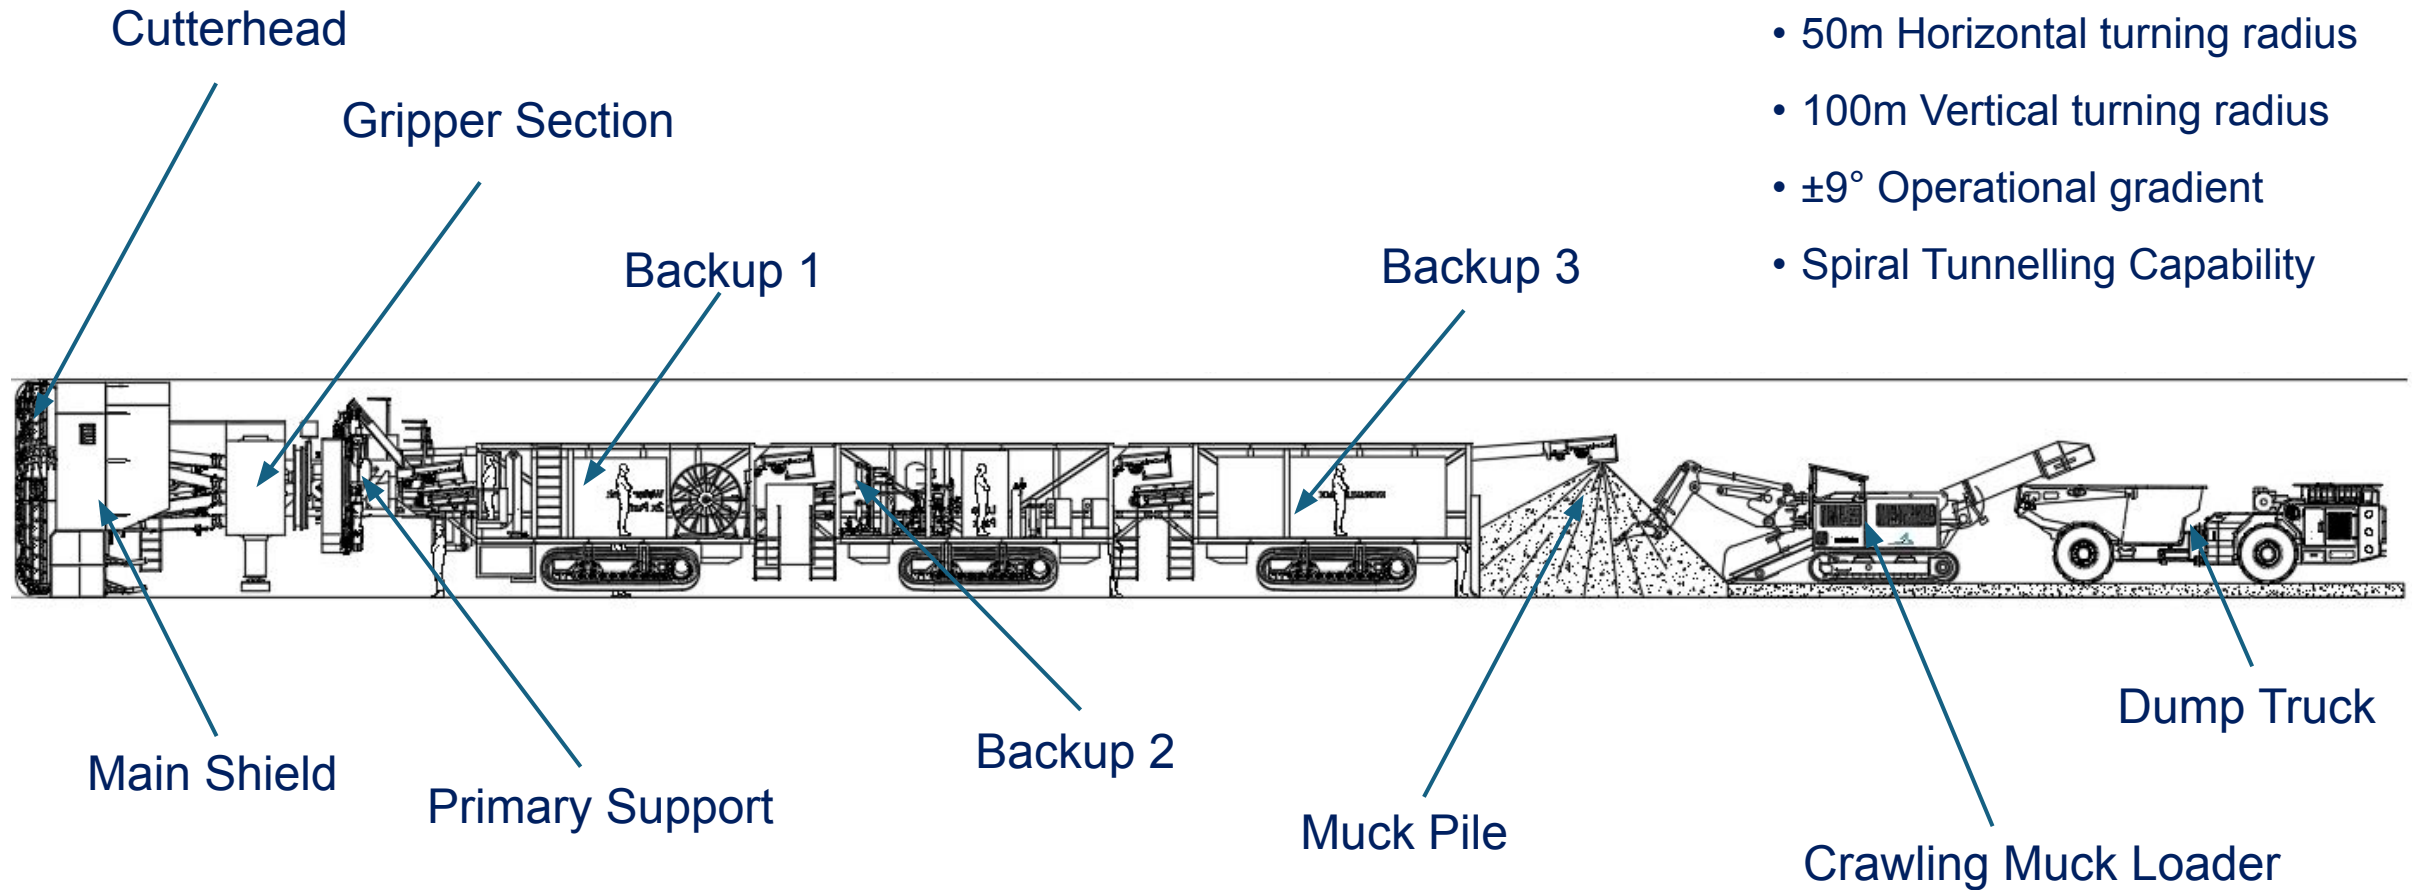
Master Drilling Mobile Tunnel Borer General Assembly
